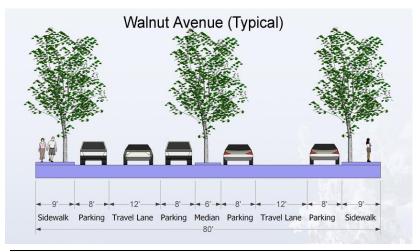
P: Walnut Avenue Retail Segment cross-section. Note that west side parking is changed to parallel to allow for a wider sidewalk and a small median. These minor modifications will substantially improve Walnut's retail/pedestrian draw.
